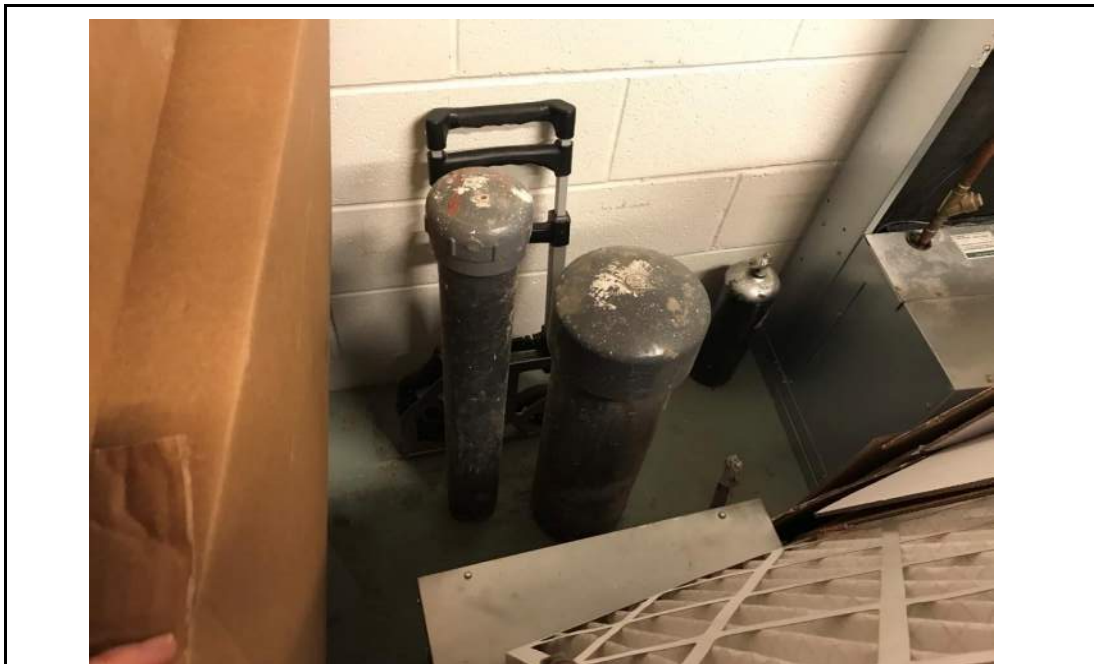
3-inch air sparge stub and 6-inch multi-phase extraction stub for future connection if groundwater treatment system activation is required, facing south. 21 April 2021.
